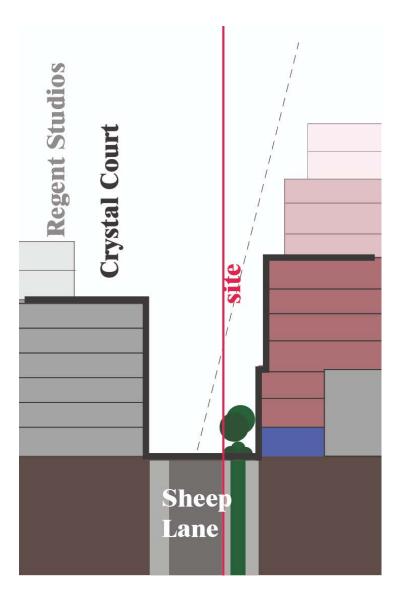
Fig X: section diagram showing an example of Sheep Lane as a Secondary street (urban neighbourhood) and the relationship of street width to height of the buildings that enclose it<sup>51</sup>
